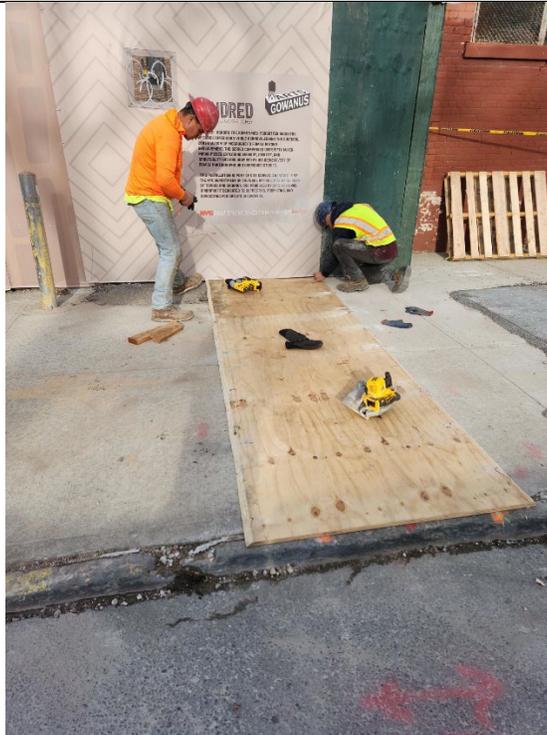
Additional view of sidewalk excavation for Con Ed.
